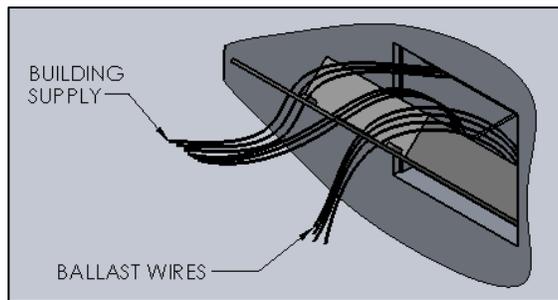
DETAIL SHOWING BUILDING SUPPLY AND DRIVER WIRE CONNECTION
